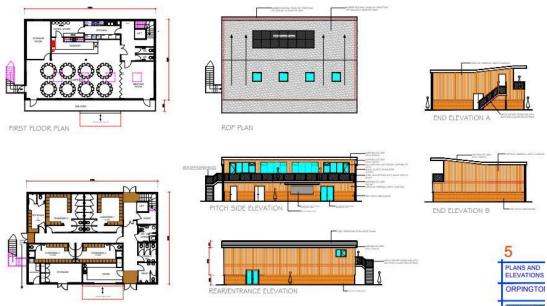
Proposed pavilion floor plan and elevations – current application (23/02527/FULL1).
